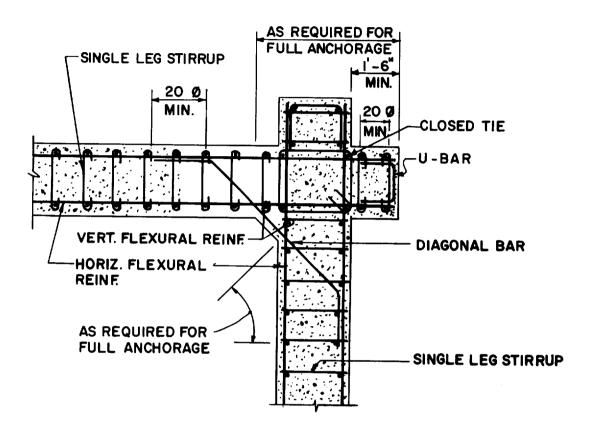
Typical detail at corner for walls reinforced with single leg stirrups
